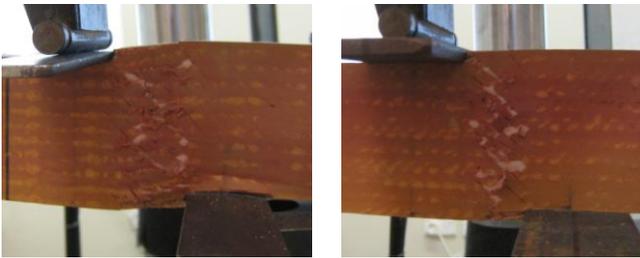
shows that the sandwich beams when loaded in-plane are more prone to local crushing and indentation failure due to its high shear strength. Excessive compressive failure under the loading points and the supports was observed for specimens tested without and with 10 mm width steel plates. Signs of localised failure were still noticeable for specimens tested with 20 mm width steel plates but none were observed for specimens with 30 mm width steel plates. This result suggests that a 30 mm width steel plate is sufficient to prevent local indentation and compressive failure in the composite sandwich beams. This has provided the basis for using this width of steel plate in the asymmetrical beam shear test of sandwich beams when loaded in-plane.
